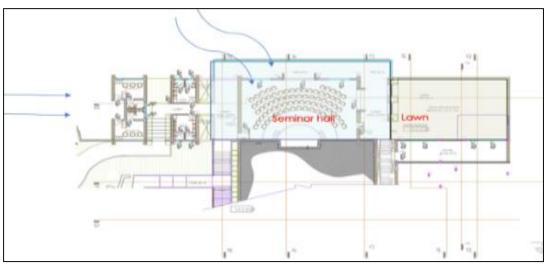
Basement Floor Plan of Grape County Resort, Nashik
